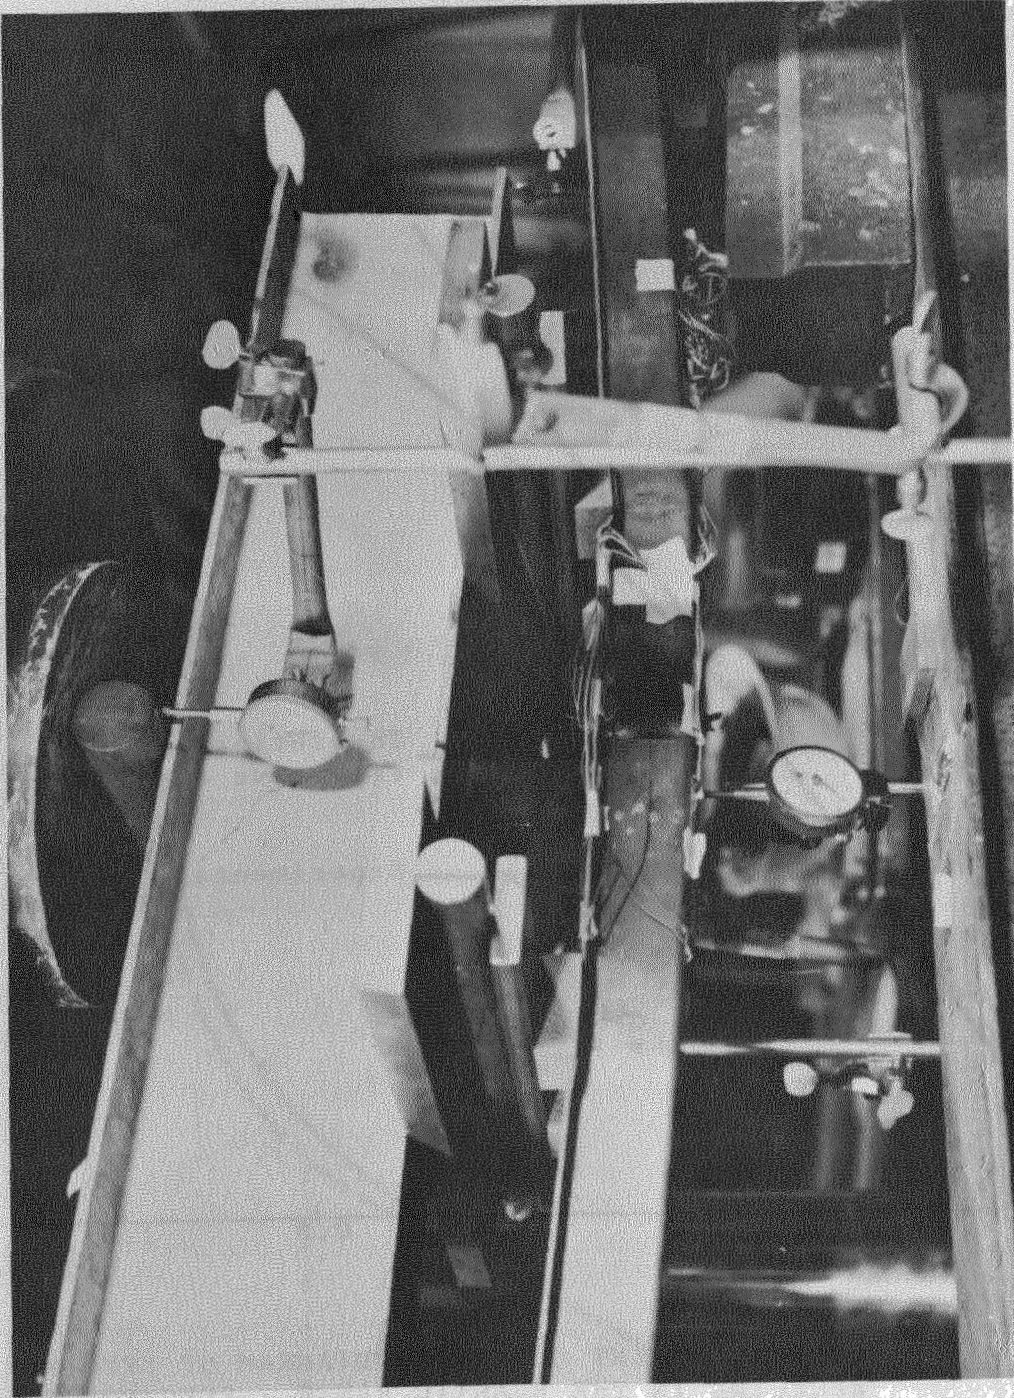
BEAM SPECIMENS - LOAD SET-UP
